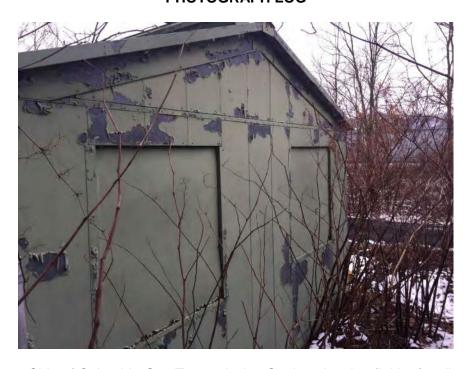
Wastewater treatment plant near intersection of Industrial Park Road and WV-2, view looking southwest from Industrial Park Road.
